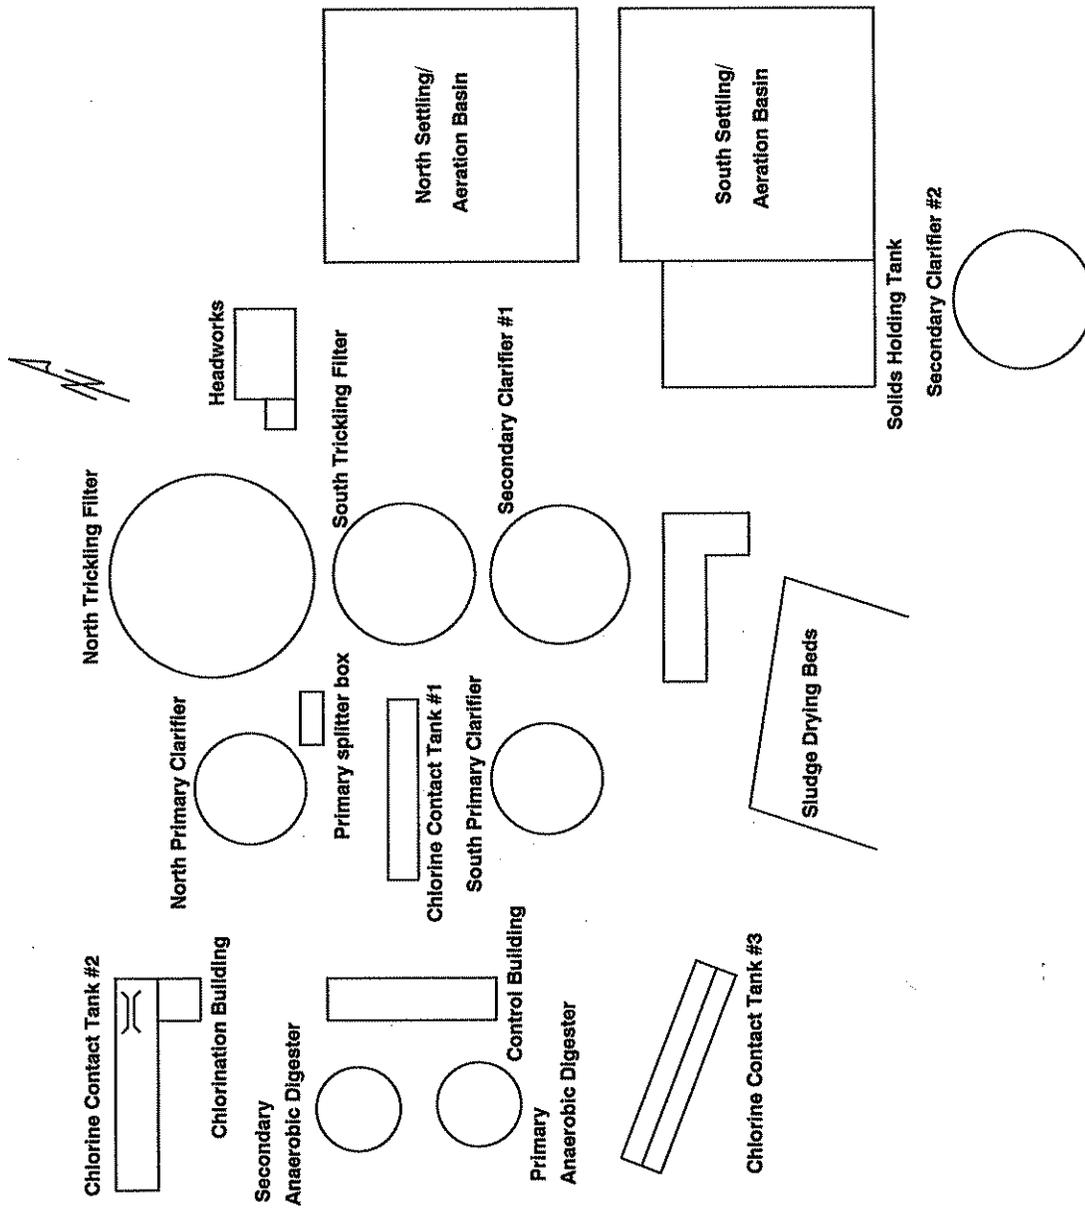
Plan View of Wastewater Treatment Plant - Chehalis, June 1997.
